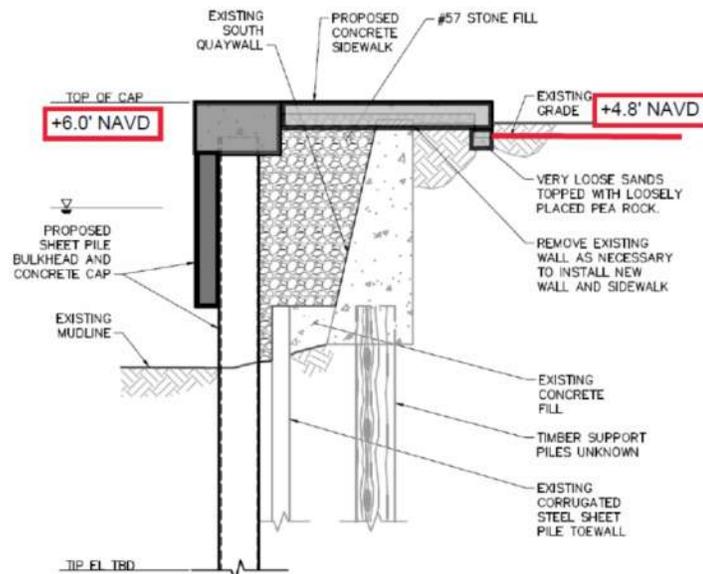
Proposed modifications to concrete seawall at Central Basin (Demens)
